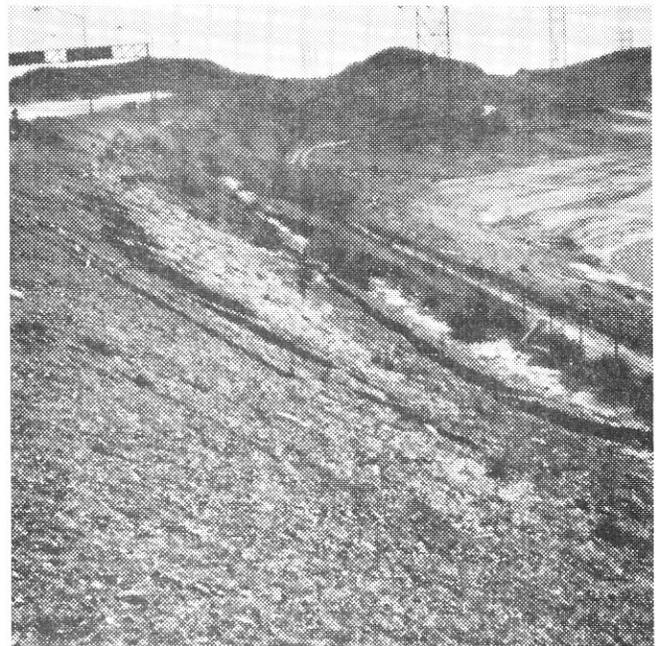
Looking south at westerly slope of embankment. Note cracks and lateral movement in slope.
